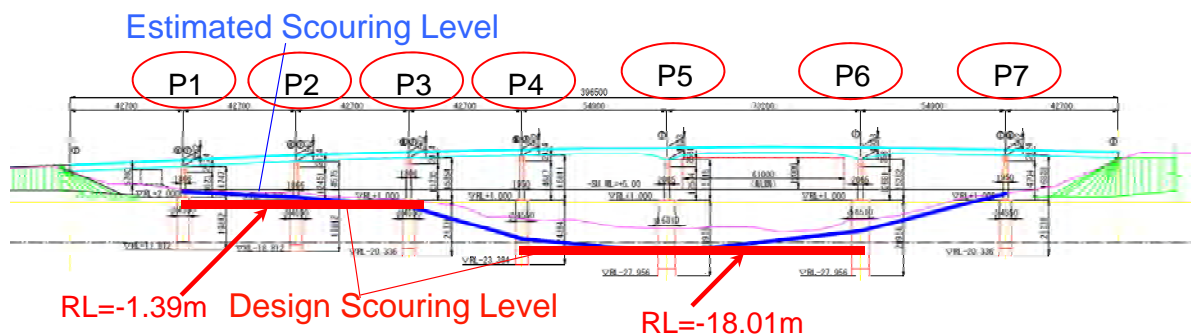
Riverbed Scouring and Design Scouring Level for the 2nd Kanchpur Bridge
